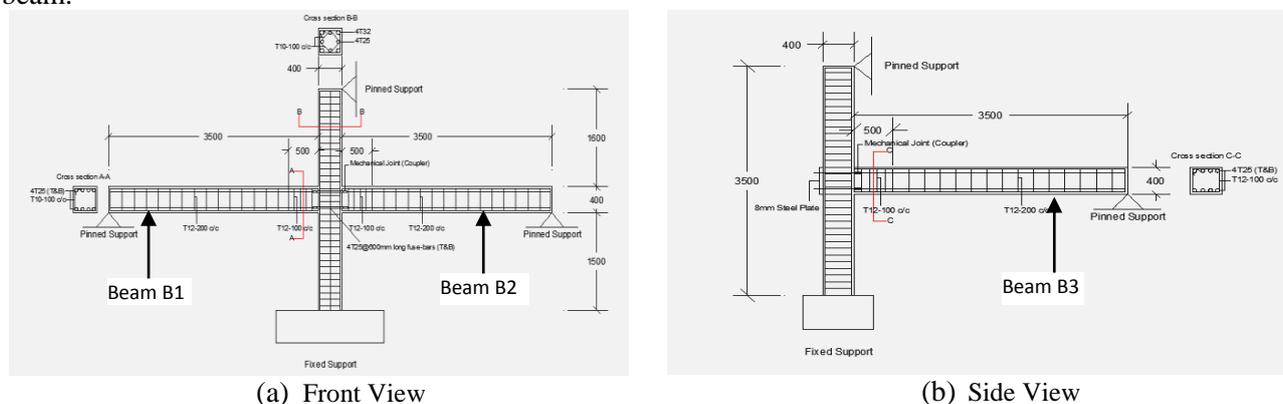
Detailing of sub-assembly of interior beam-column joint using fuse-bars
